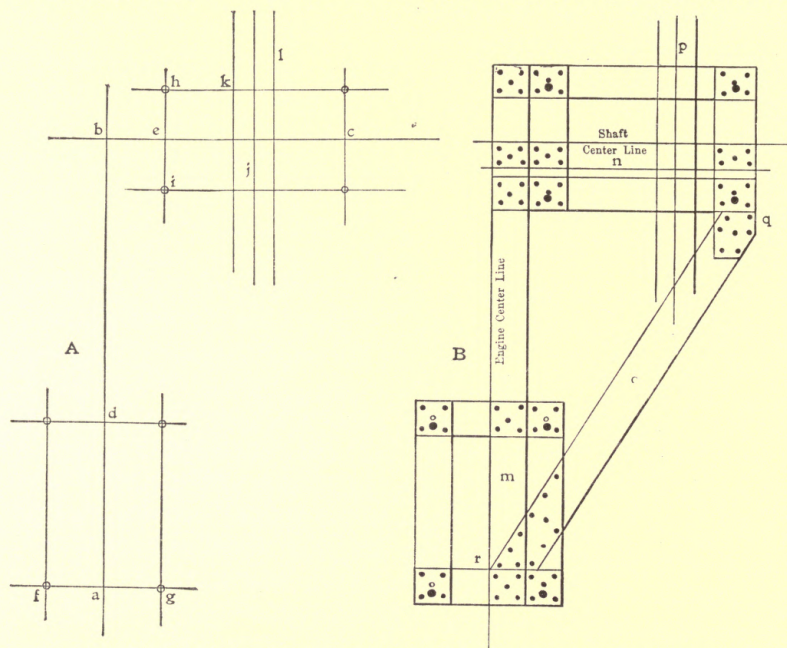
LAYING OUT AND CONSTRUCTING A TEMPLET.
